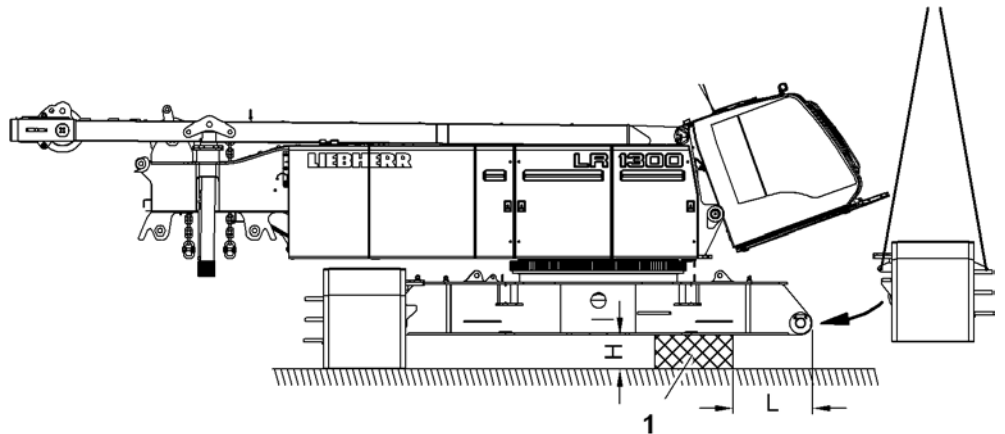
Attaching the second crawler side frame without a self-assembly system
